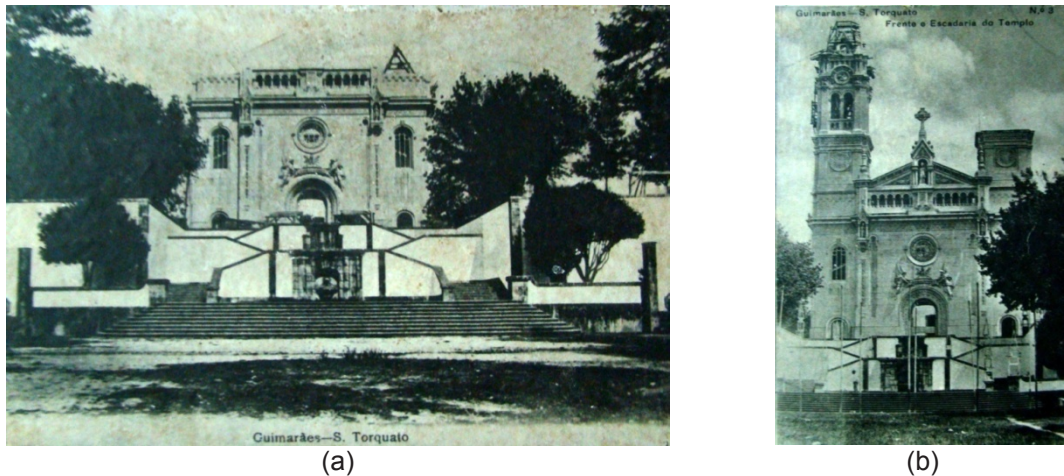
Early stages of the construction (San Torcato Museum): (a) main façade without towers, and (b) the first tower construction.
